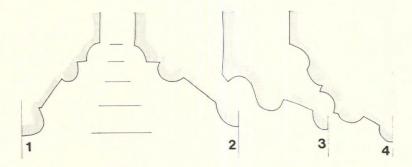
Moat Farm, Marston Mortaine. Beam Mouldings 1-4. Nos 1-3 are as marked in Fig 3. No. 4 is the upper floor ceiling beam in the East wing. Scale: ¼ full size.
